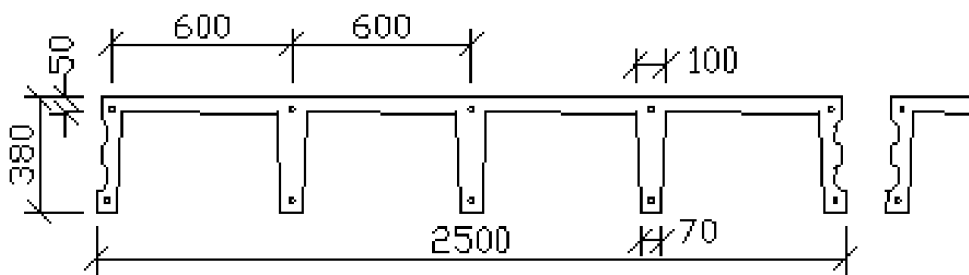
Longitudinal cross-section of precast segments. Longitudinal ribs are 50 mm-wide only at the bottom. (lengths in mm) (Toutlemonde et al., 2007)
